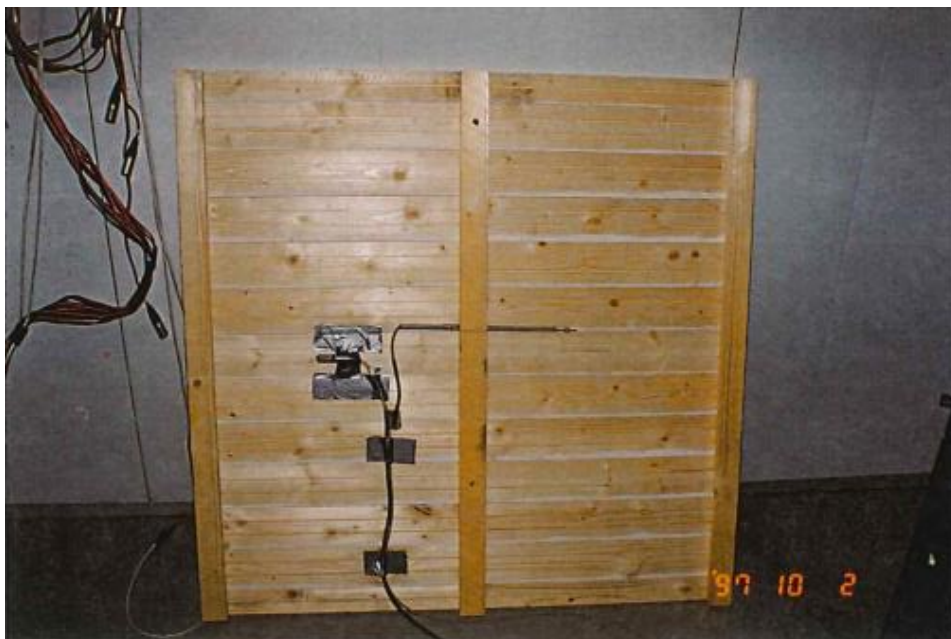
Detachable horizontal paneling was used as exterior cladding in test walls. Copied from Water vapour transmission in wall structures due to diffusion and convection. Publication 103 structural engineering. Vinha, J, Käkelä, P (1999) p. 87
